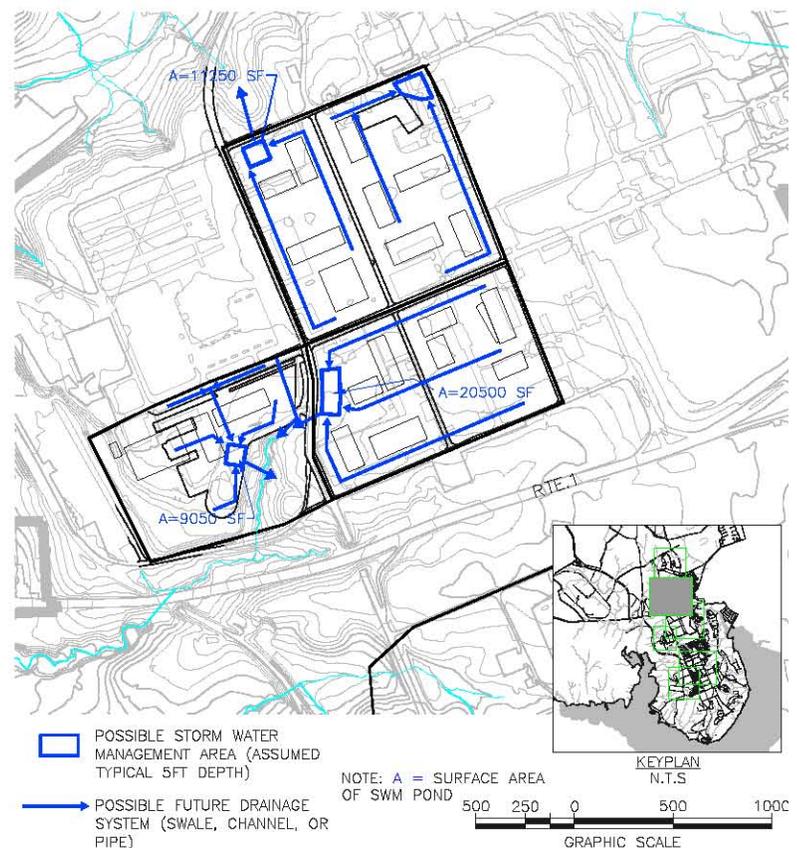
Lower North Post Storm Water - Long Term Plan (2030)
